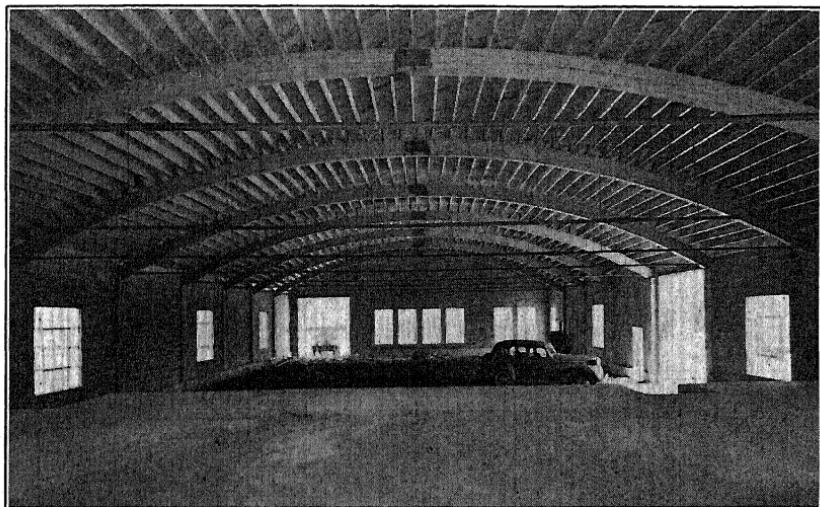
Glued laminated arches spanning 58 ft. Fabricated by Rilco.
